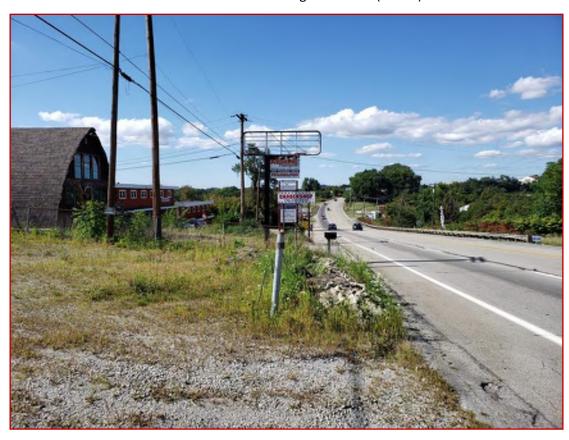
S.R. 30 Near Barbershop - Facing Northwest (9.5.19)
